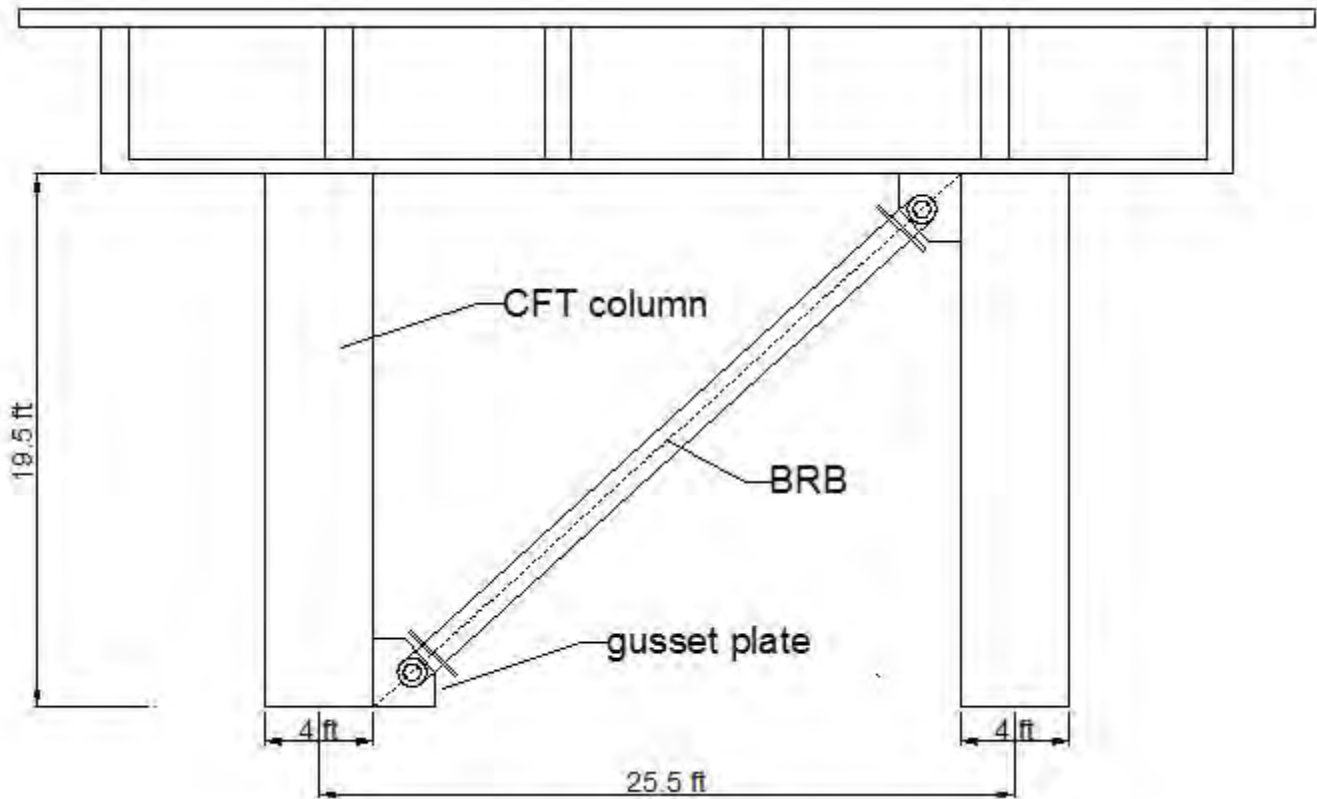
The elevation of the bridge bent in the transverse direction with single BRB
